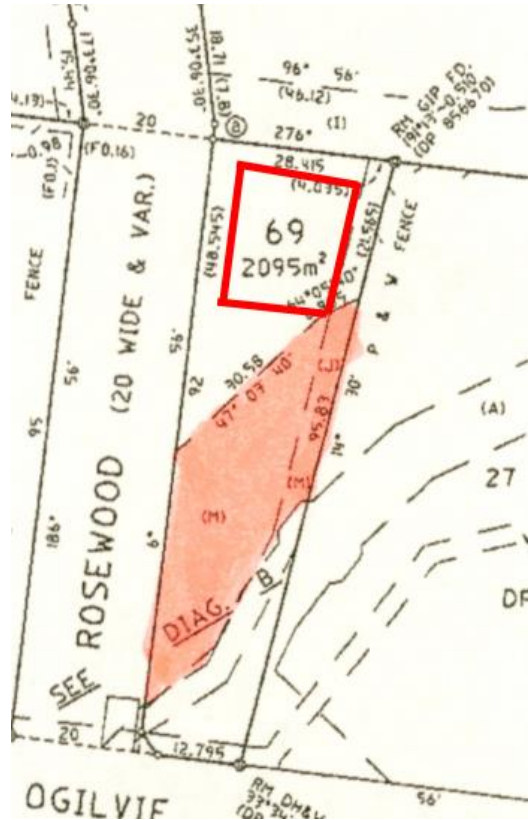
shows proposed Lot 68 (now Lot 69) and the remaining available building area, the red area shows a regular shaped building envelope once setbacks and easements are taken into account.
